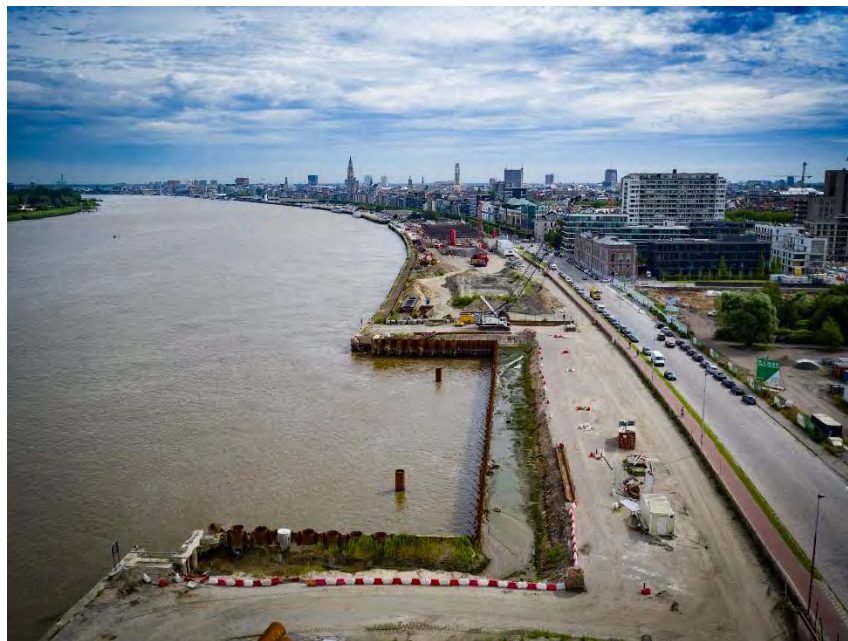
Aerial view of project zone after demolition of quay wall in the first zone (source: Braincube commissioned by DVW)
